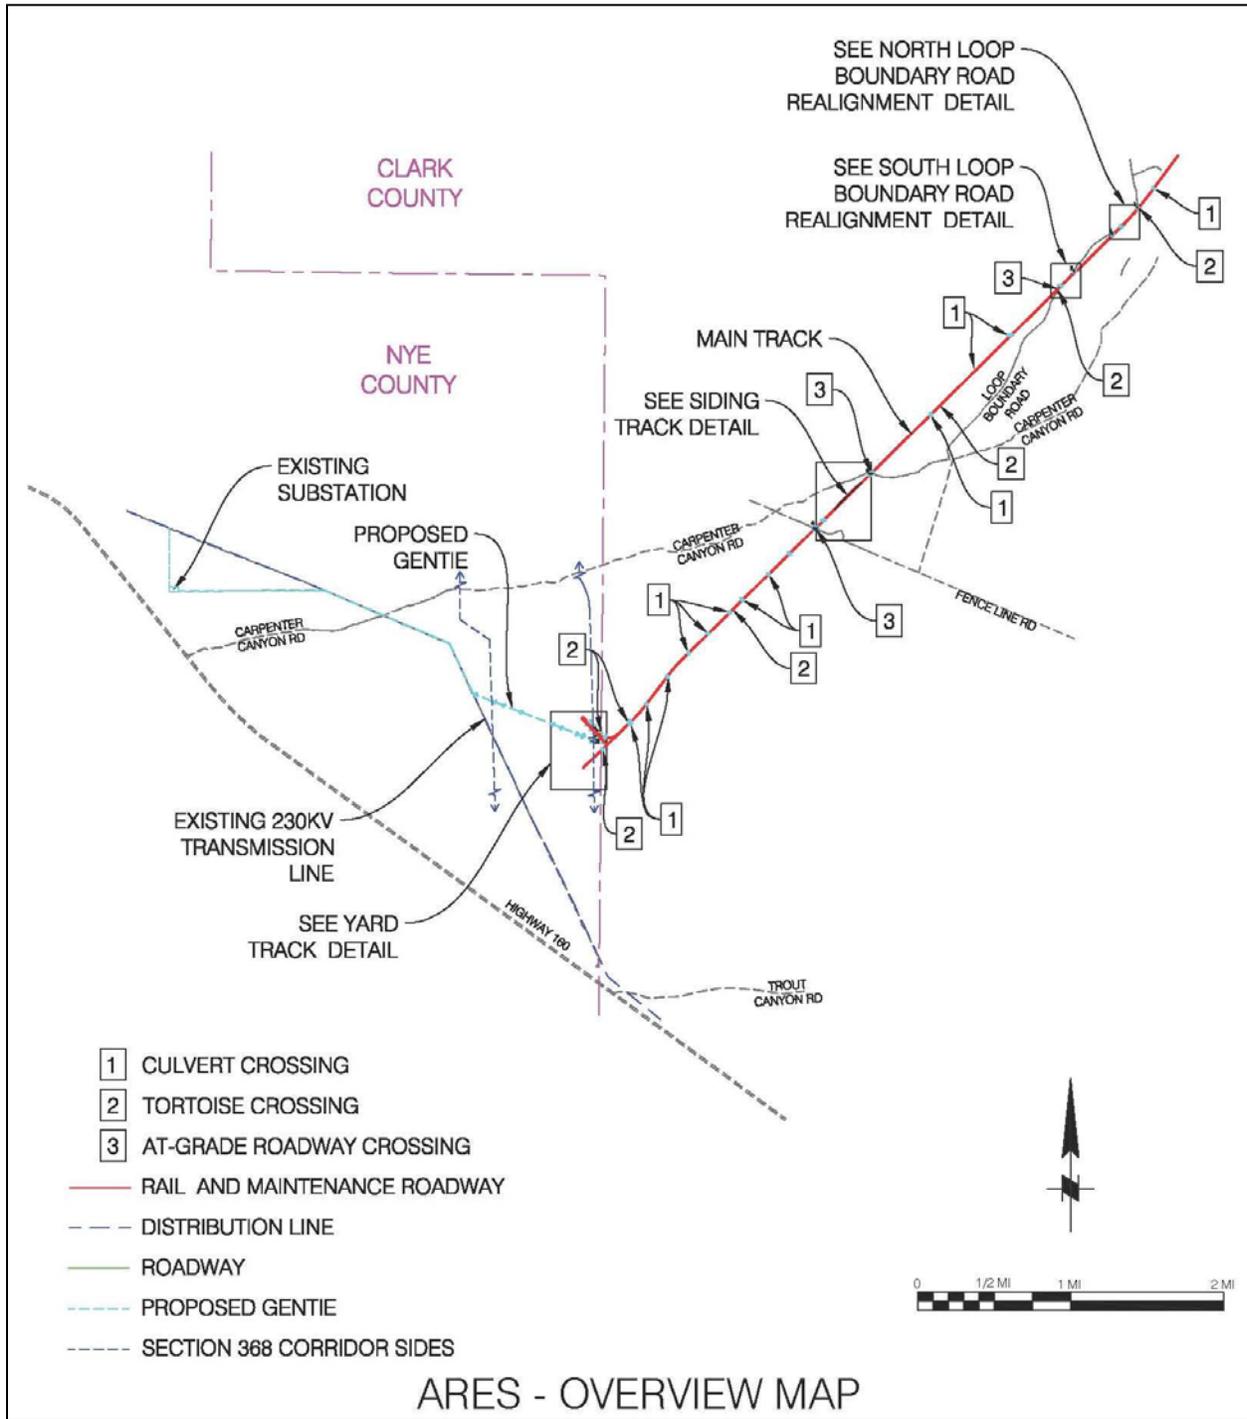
Proposed culvert, road, and tortoise crossing locations within the rail corridor for the Proposed Action.
